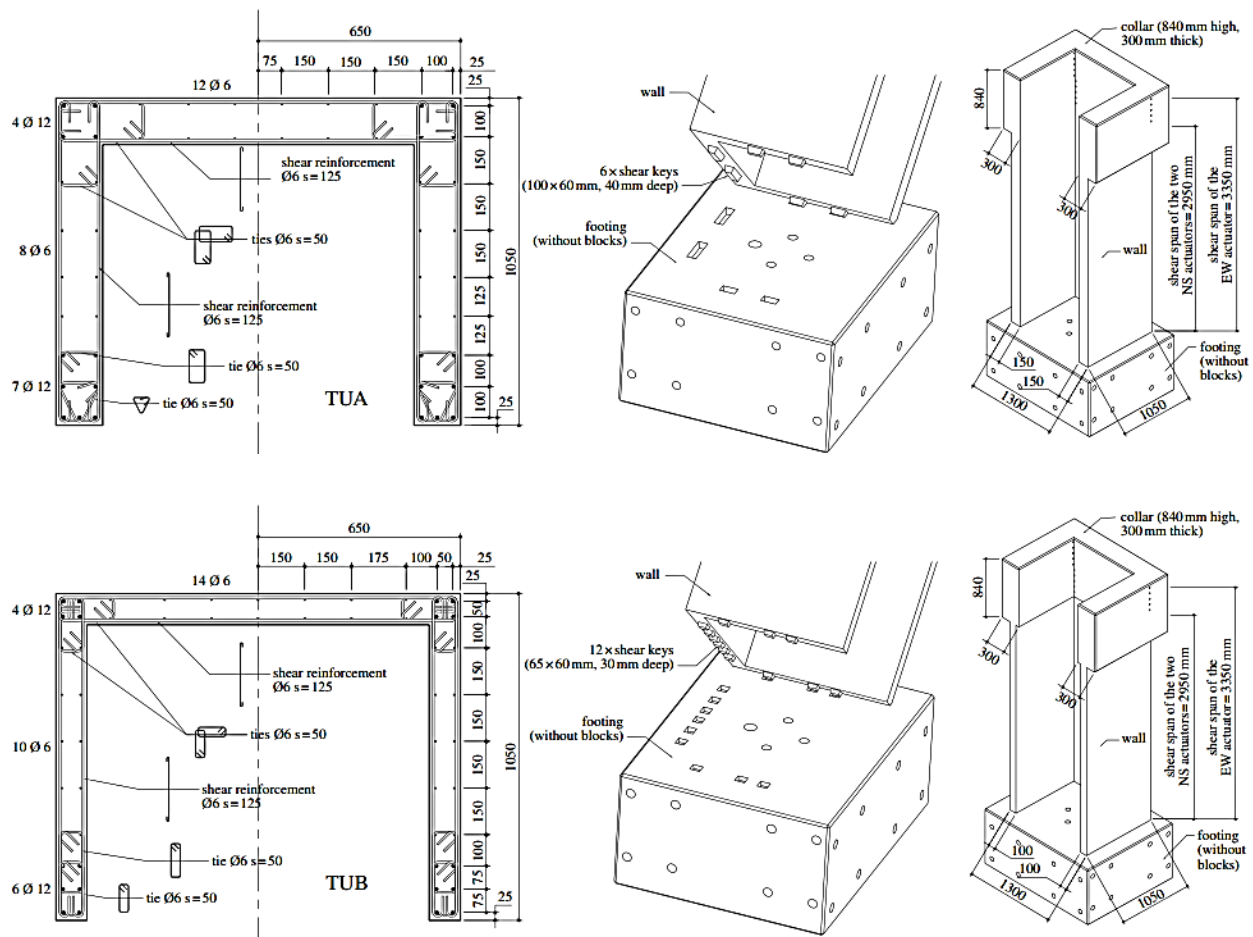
Test Specimen Geometry and Reinforcement Details for Beyer et al. [34]
